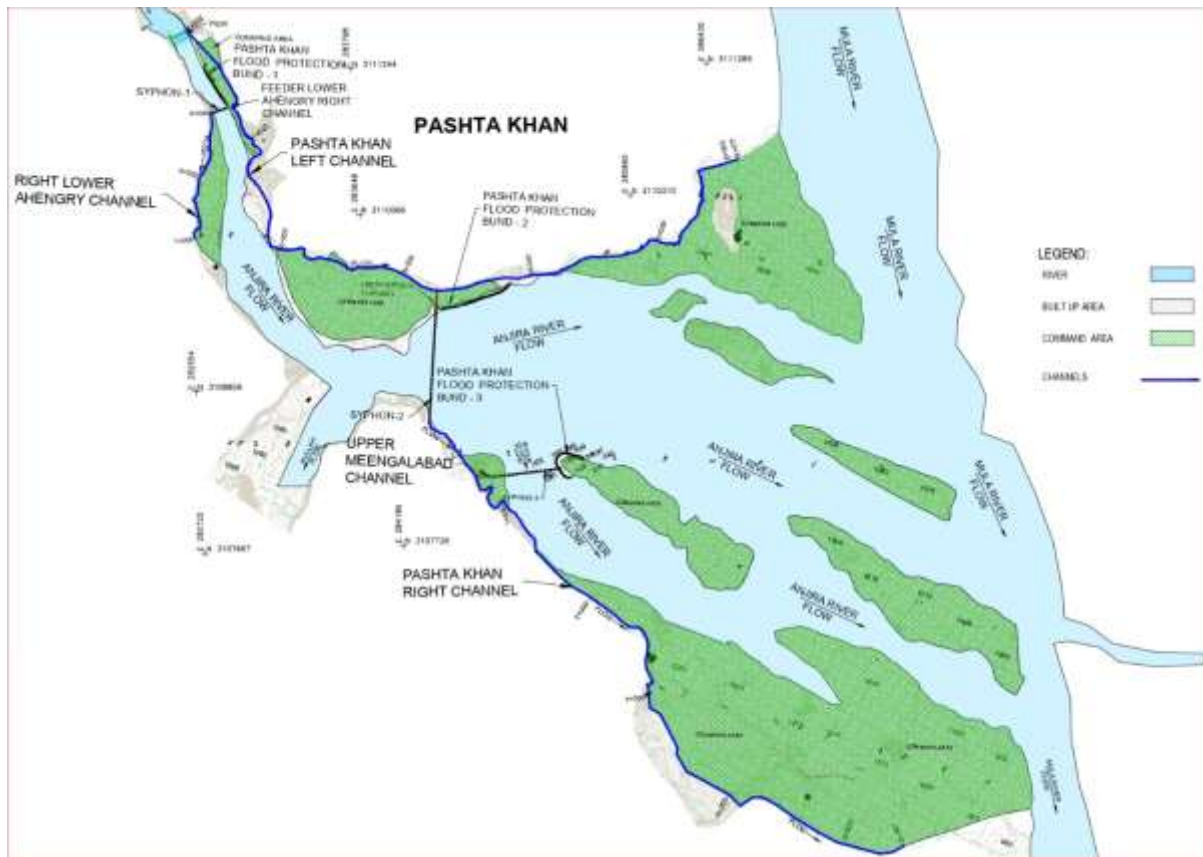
Layout of Pashta Khan Flood Protection Bunds
